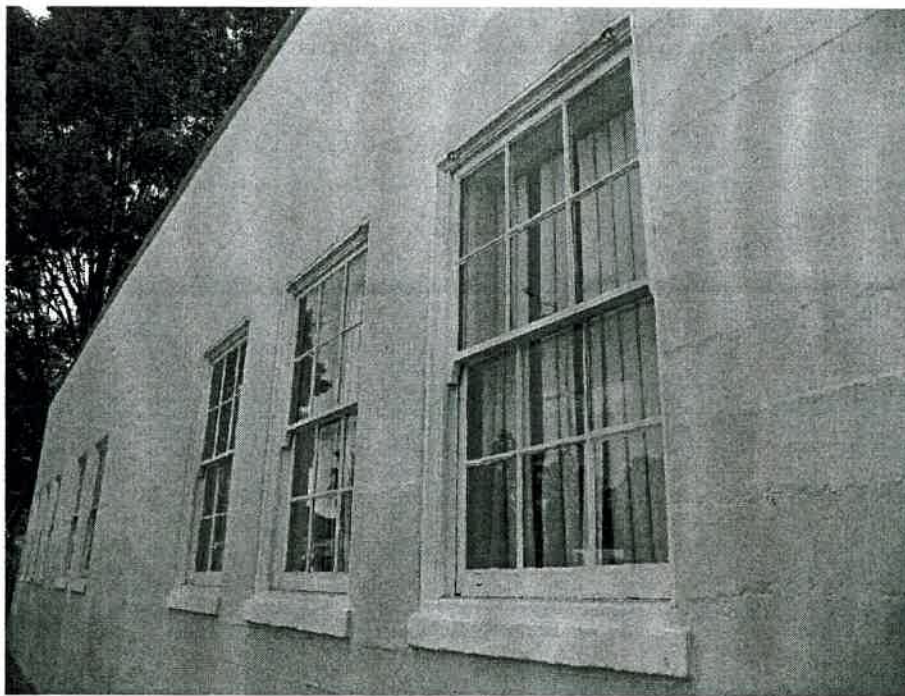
Wood sash windows along northwest elevation of the c. 1919 portion of Building 800. (Carey & Co. Inc., 2006)
